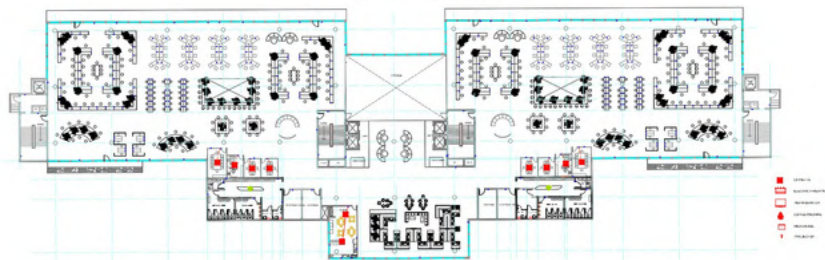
EQUIPMENT LAYOUT (TOWER B)
